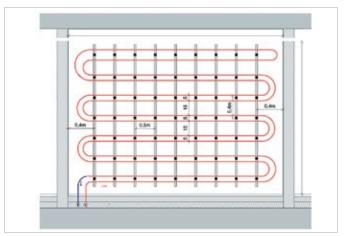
Installation with an average installation pipe spacing of 10 cm avoiding air sack formation at the redirection
